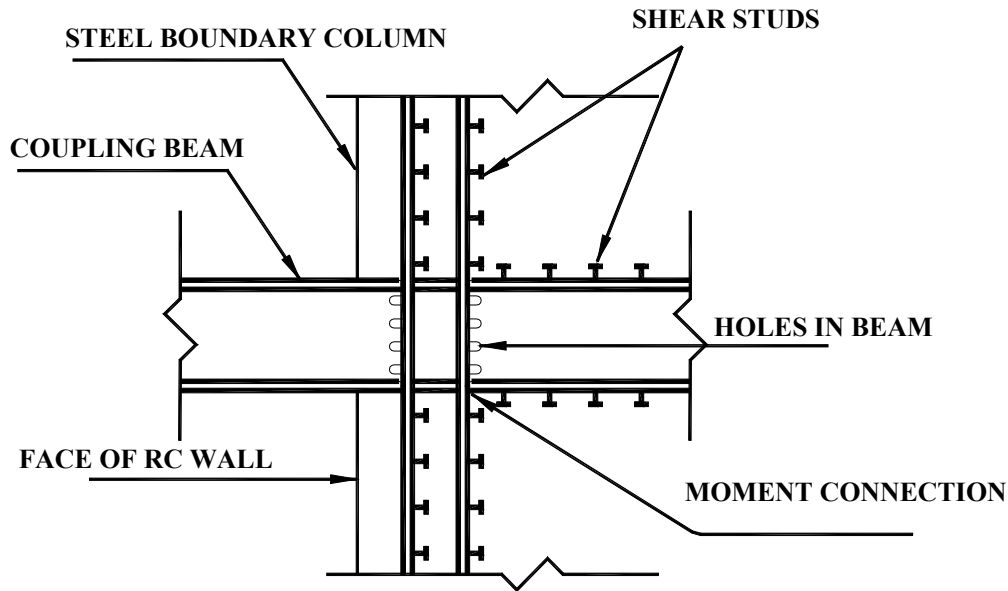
Wall Steel Coupling Beam Connection With Steel Boundary Column for High-Rise Buildings (Gong and Shahrooz, 1998)
